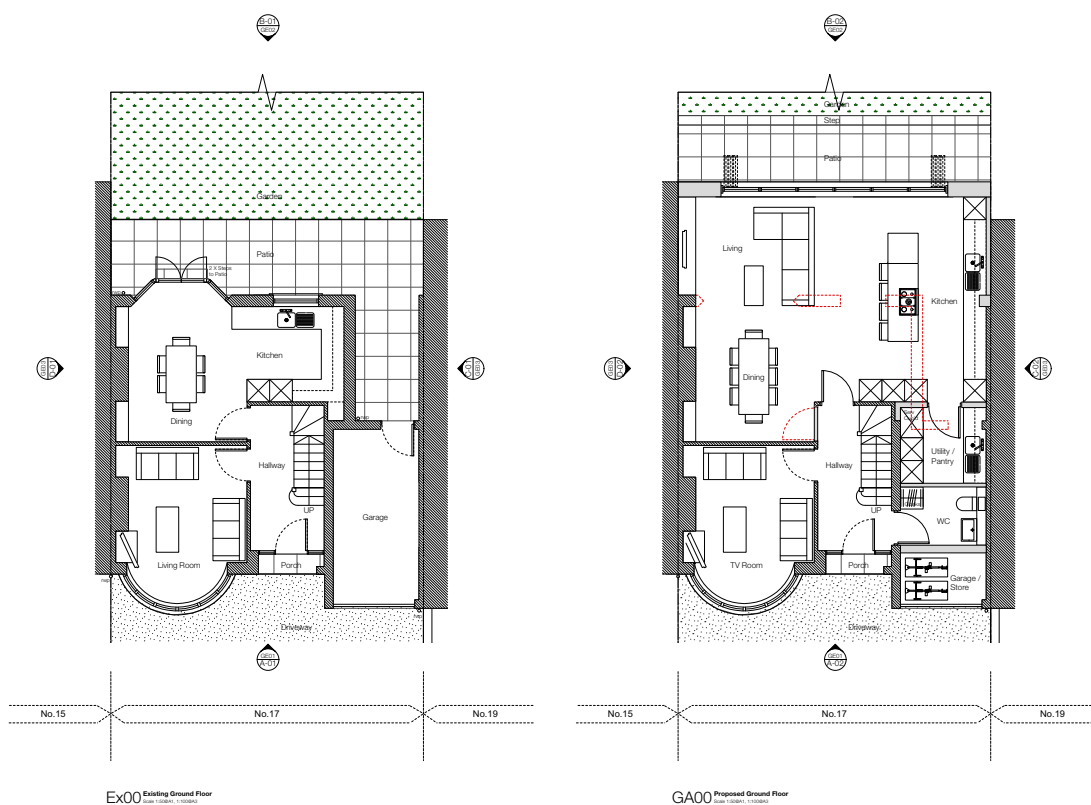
Existing and Proposed Ground Floor Plans (not to scale)
